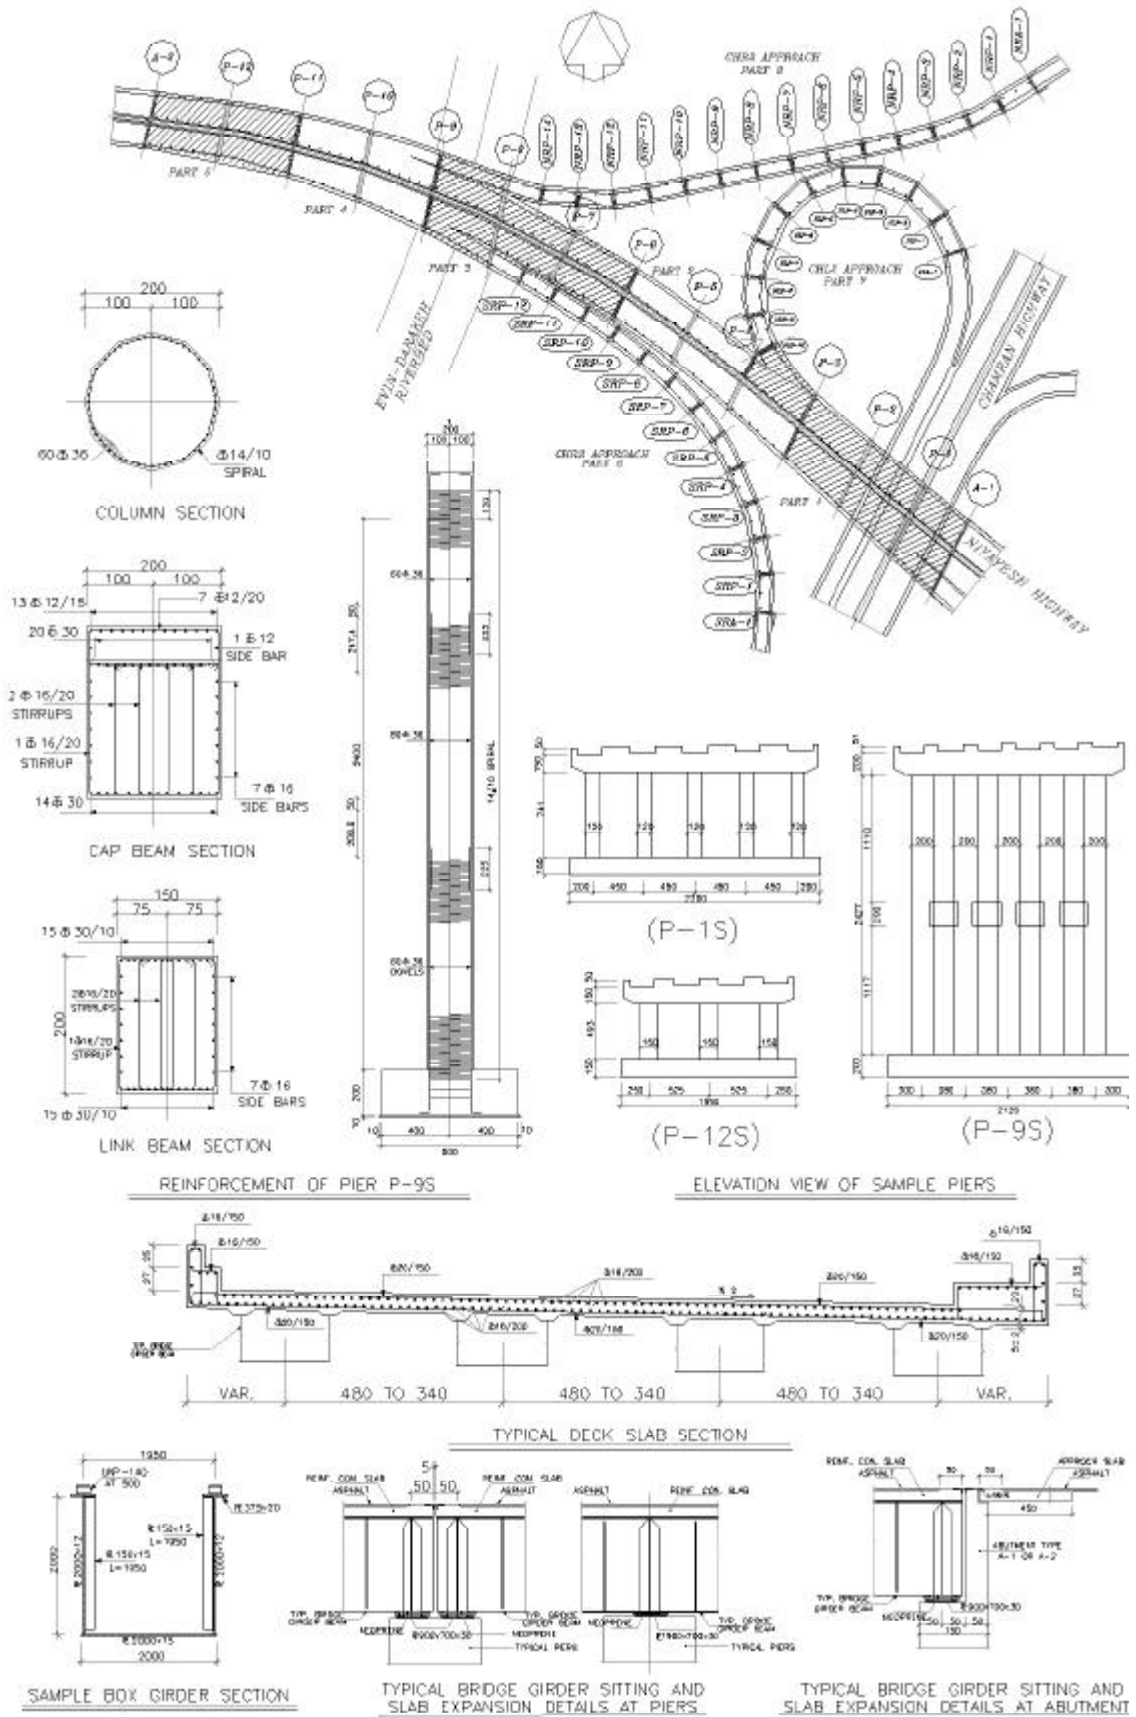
Plan view and typical detailing of Evin-Valley Bridge.
